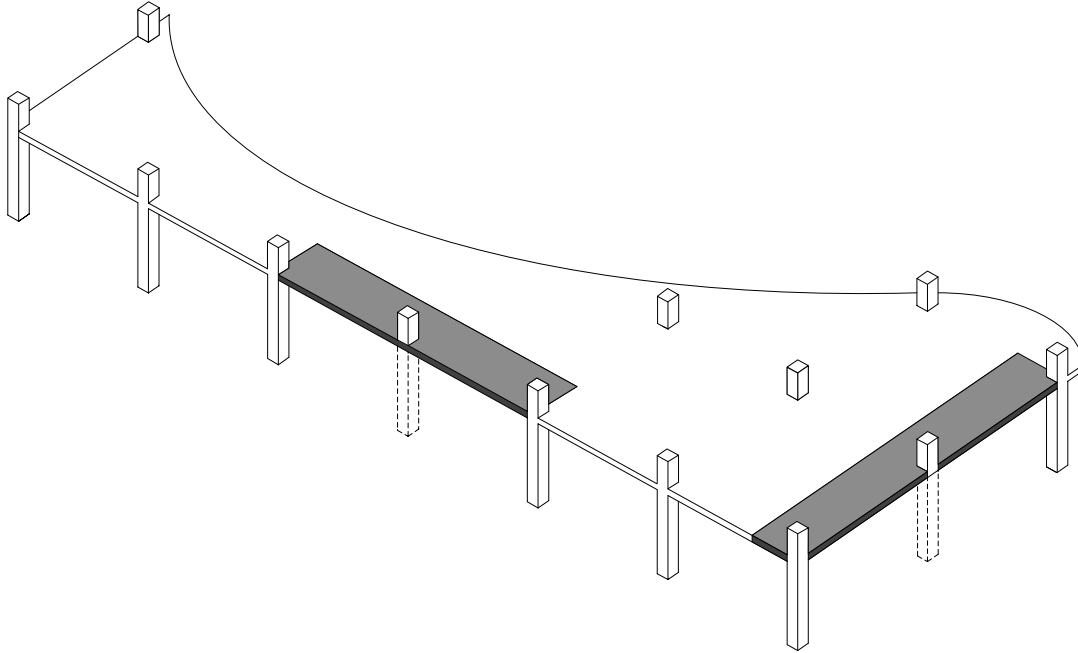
Improvement of the design of floor slabs in the outer column strip regions only, when edge column is removed (provided continuous bottom and top reinforcement).
